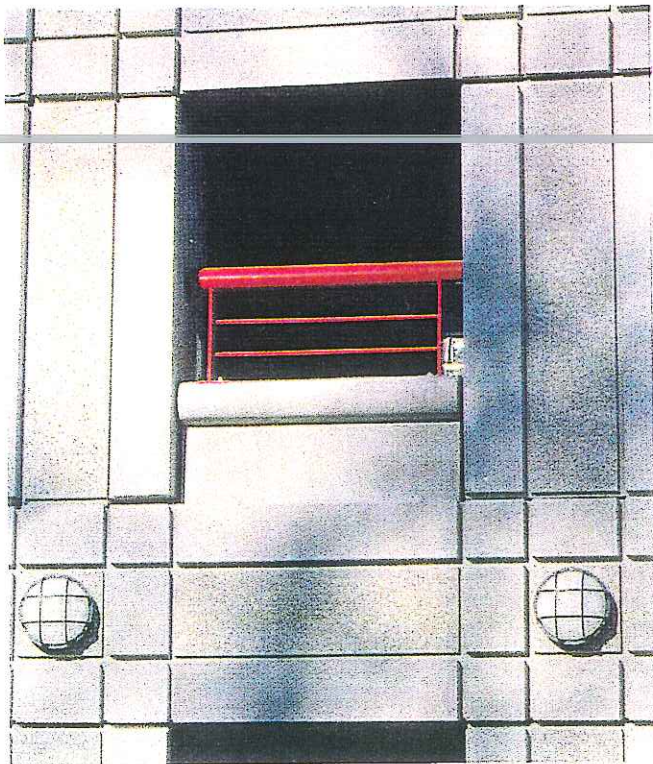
Closeup of architectural precast concrete detail at openings. Photo courtesy: Northeast Concrete Products.
